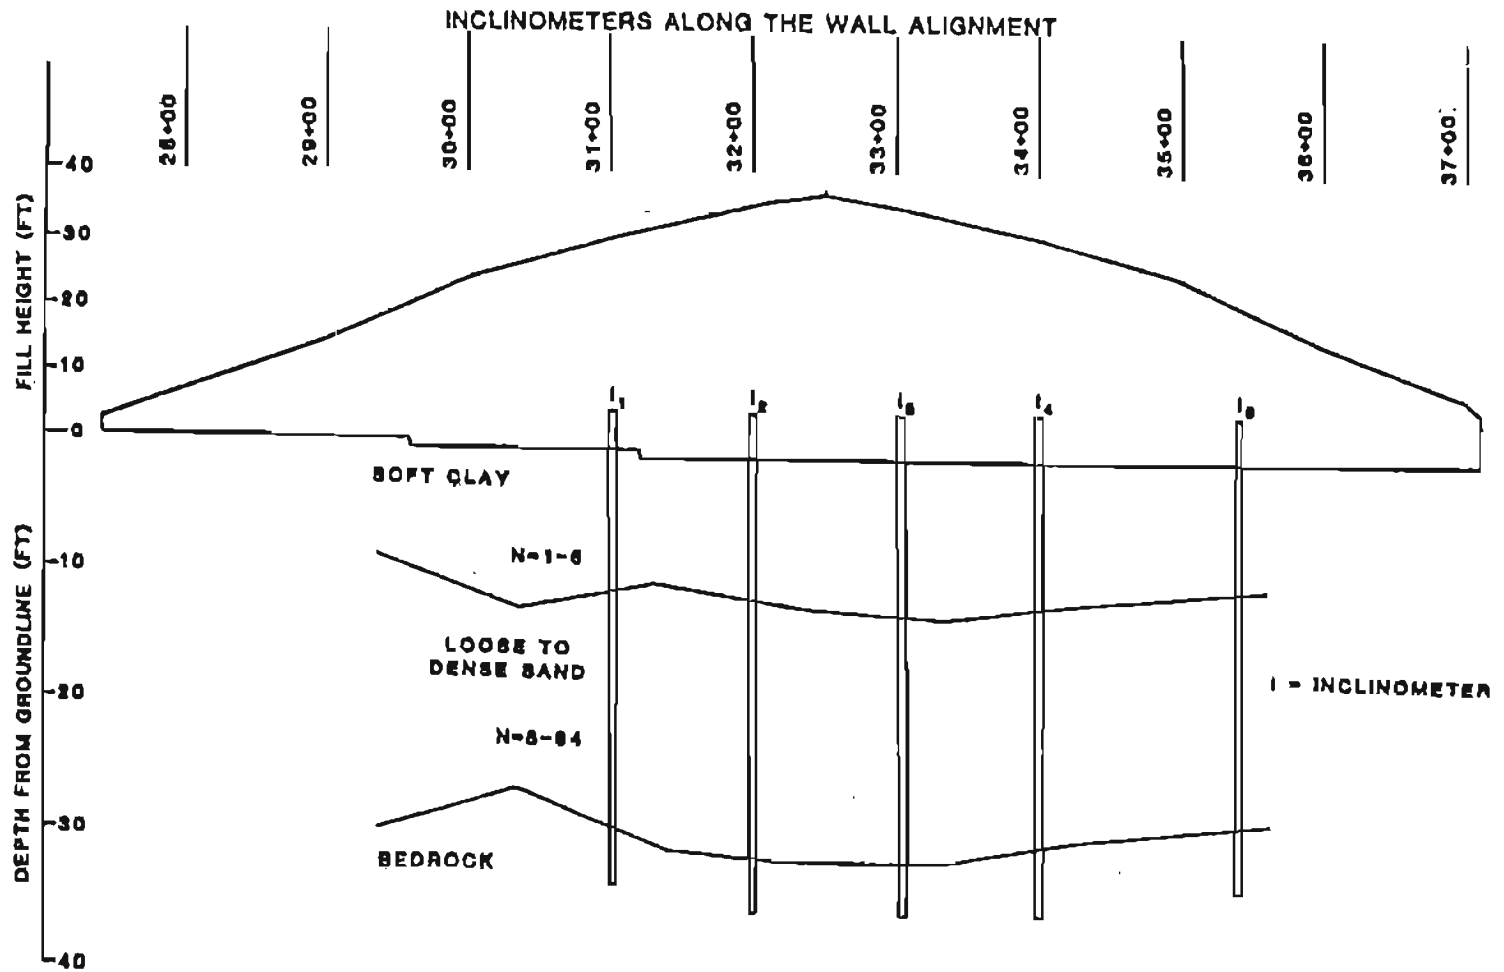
Wall Profile and Typical Subsurface Strata of the Julesburg wall
